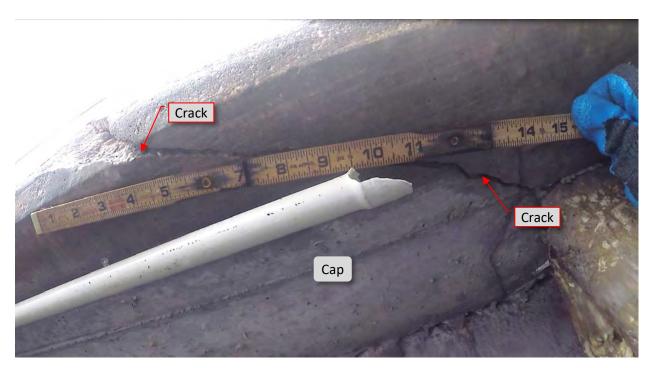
C1. STA 4+84 - 4+93. One crack spalled west direction on cap from pile's top.
